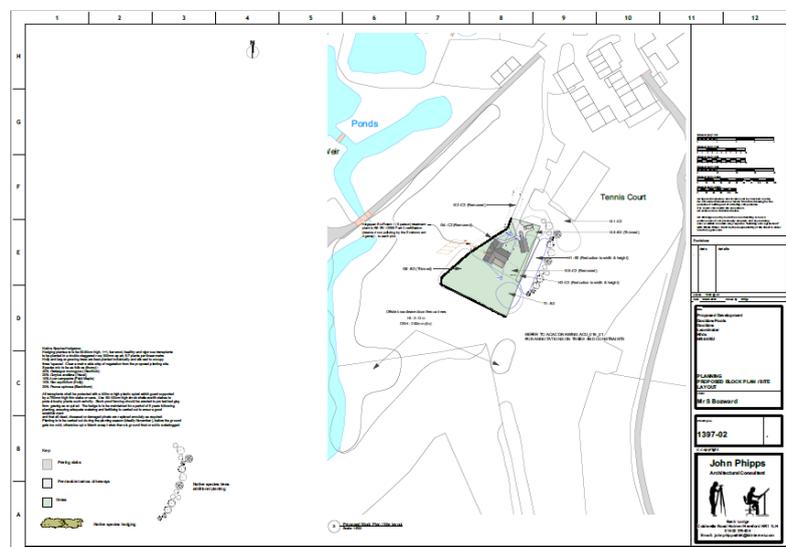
Proposed Block Plan/Site Layout shown 'indicatively'
